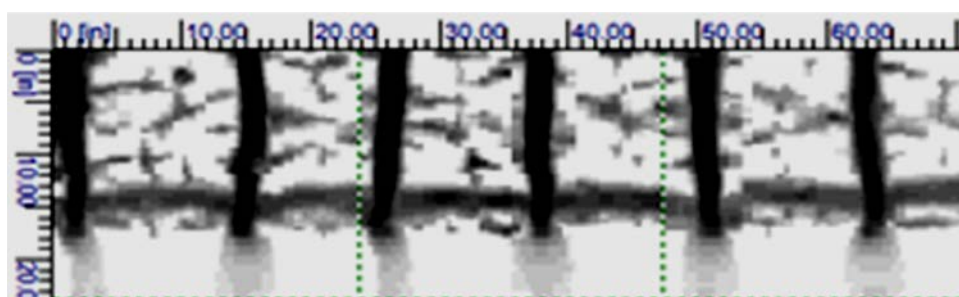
Blockscan of side face of exterior beam (Bridge 8825).
